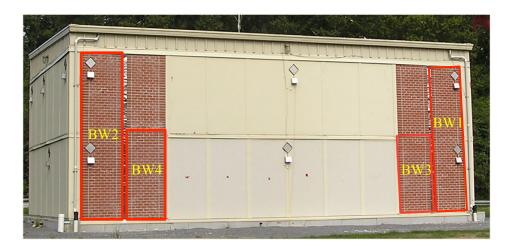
Four Brick Wall Locations on Southeast Façade of BETF.
